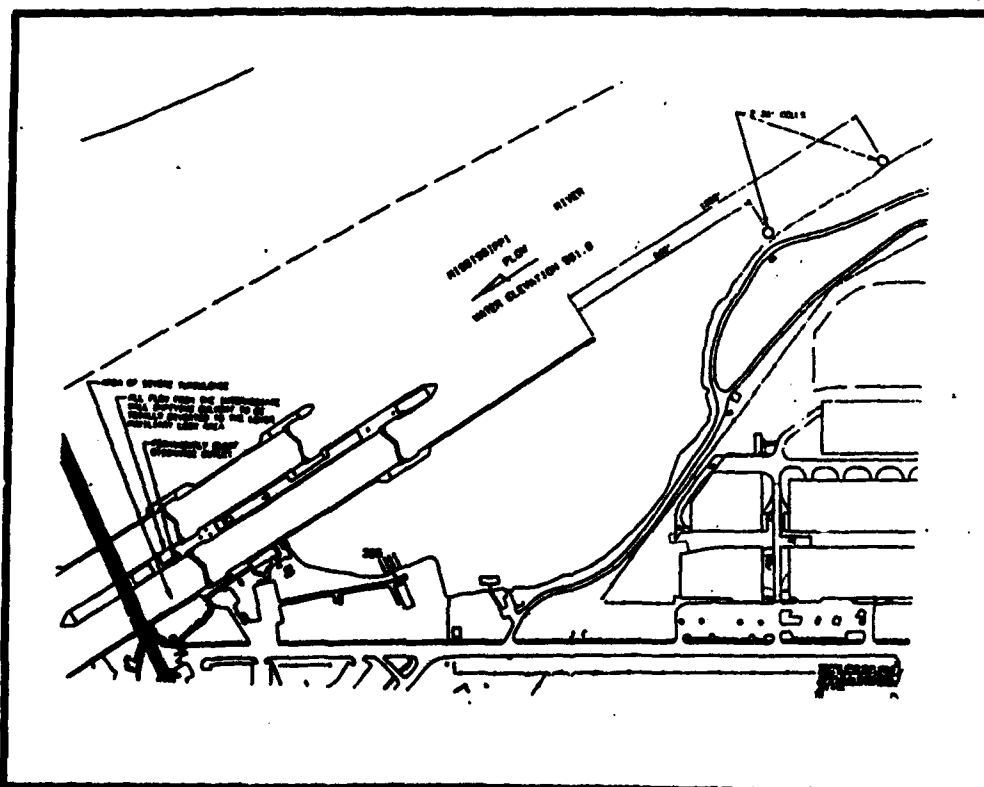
Plan of upper guide cells and modifications to lower discharge outlet at Lock and Dam 15.
